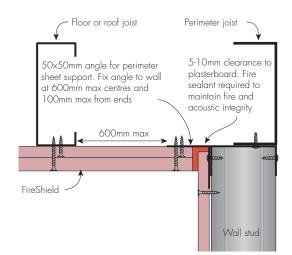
Fire Rated Ceiling to Wall Direct fixed to joist
